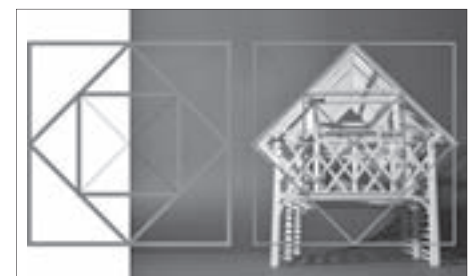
THEORY OF CORBELLING IN PRACTICE: GROUND PLAN, CROSS SECTION AND EQUILATERAL TRIANGLE, DEFINING THE MIDDLE OF THE WALL AND TOP STONE
